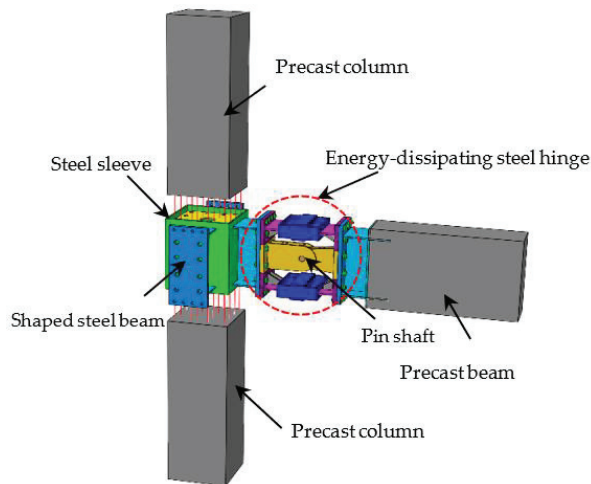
Precast replaceable beam-to-column joint with an energy-dissipating steel hinge.
